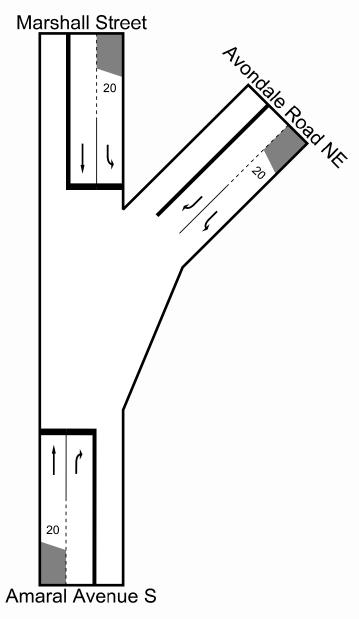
Avondale Road/Amaral Avenue/Marshall Street 2008 Intersection Layout
